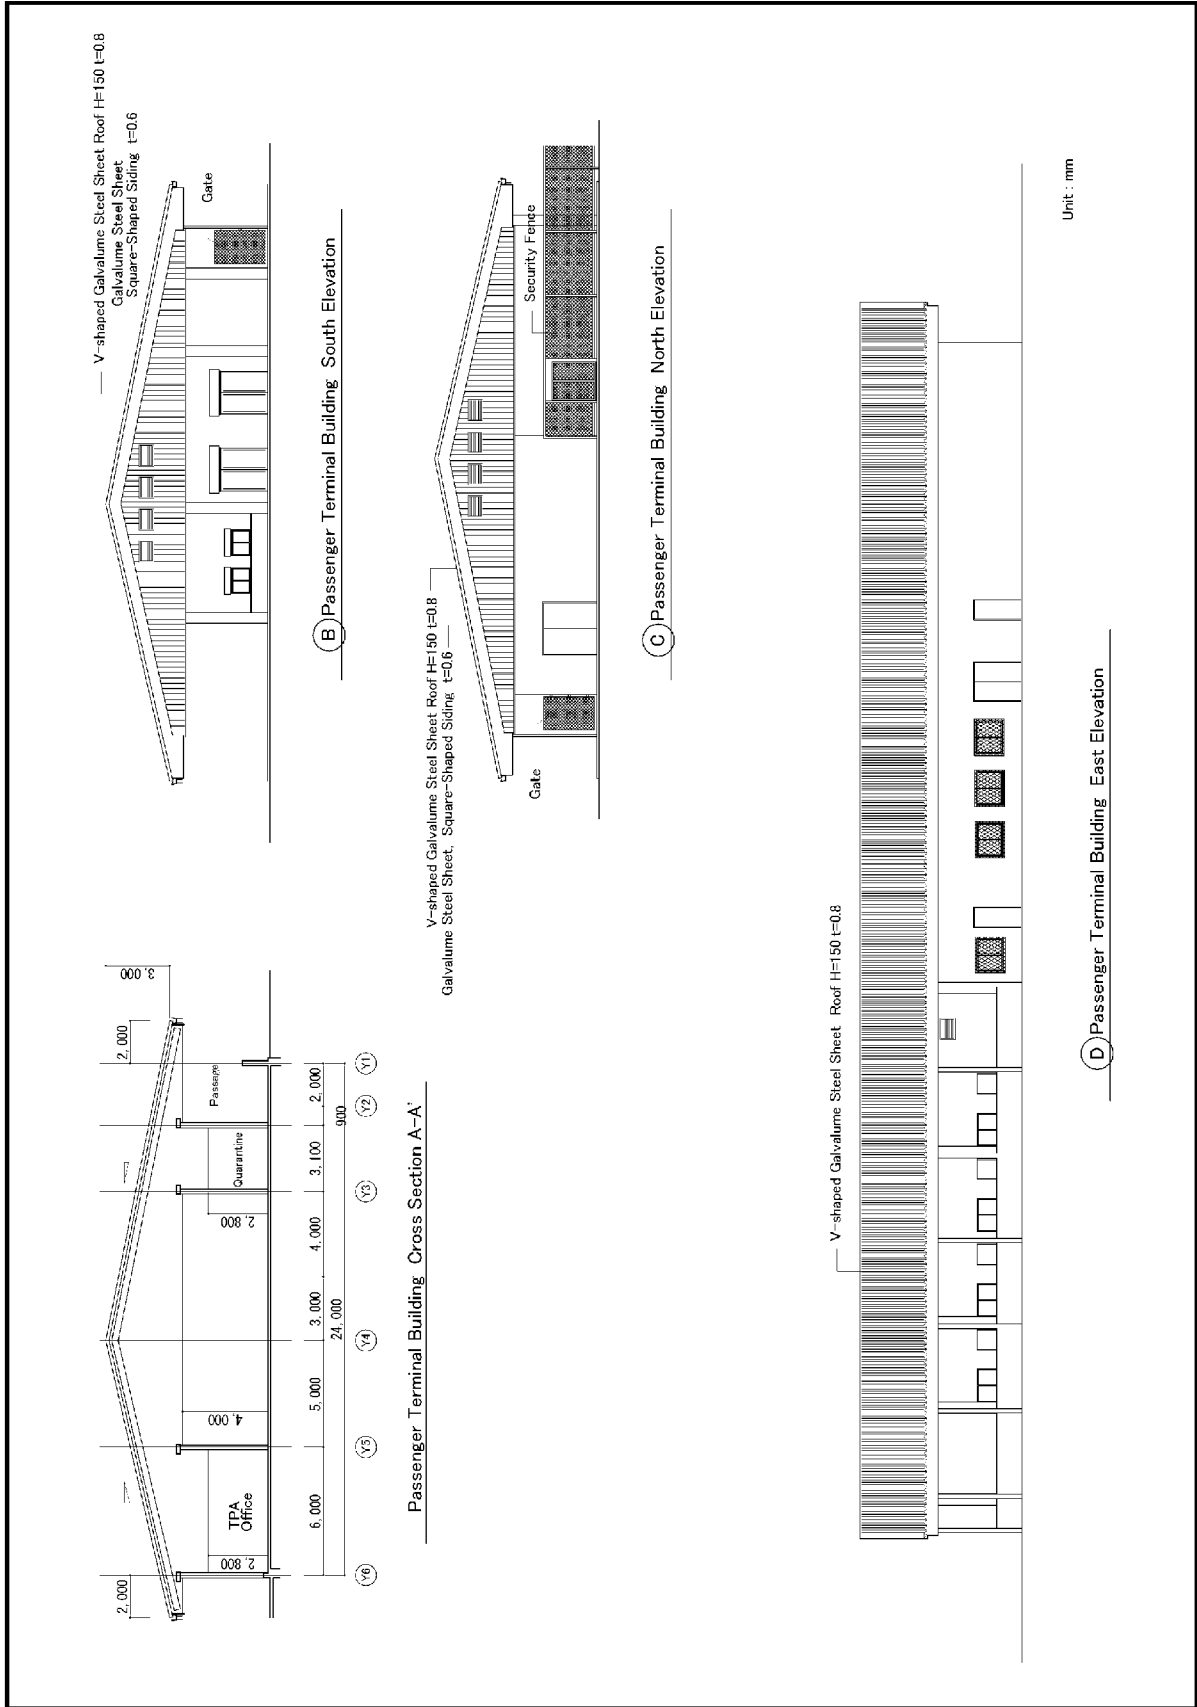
Elevation Plan of Passenger Terminal Building
